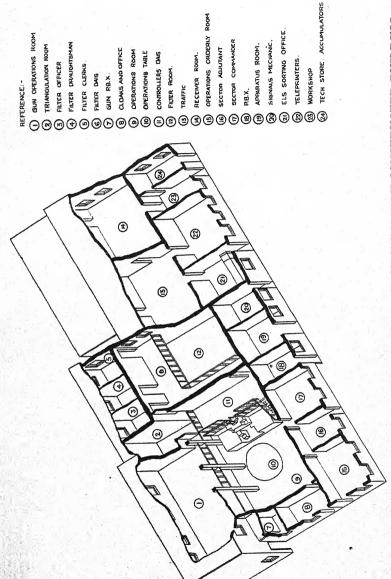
,—SECTOR OPERATIONS ROOM—PLAN OF SPECIALLY CONSTRUCTED BUILDING. (IN OPERATIONS ONLY ESSENTIAL ROOMS ARE PROVIDED, OFTEN IN ADAPTED BUILDINGS)
